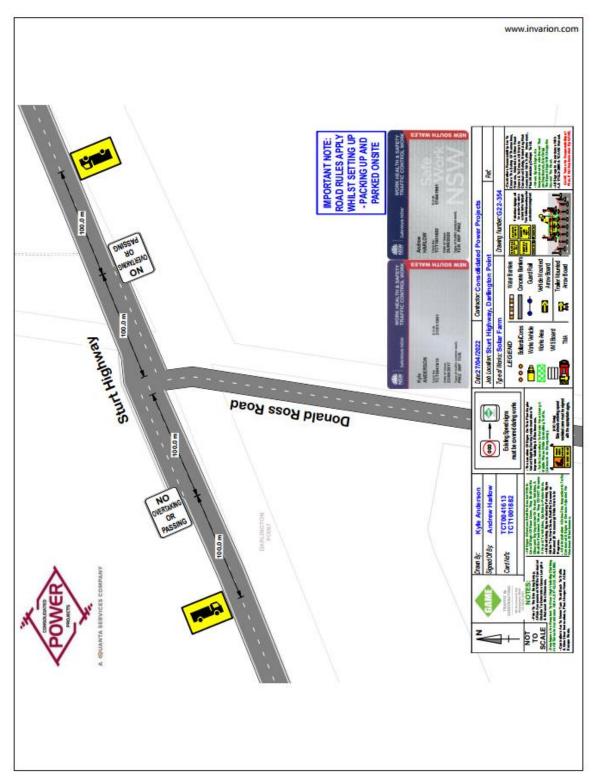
TRAFFIC CONTROL PLAN (STURTHWAY)
